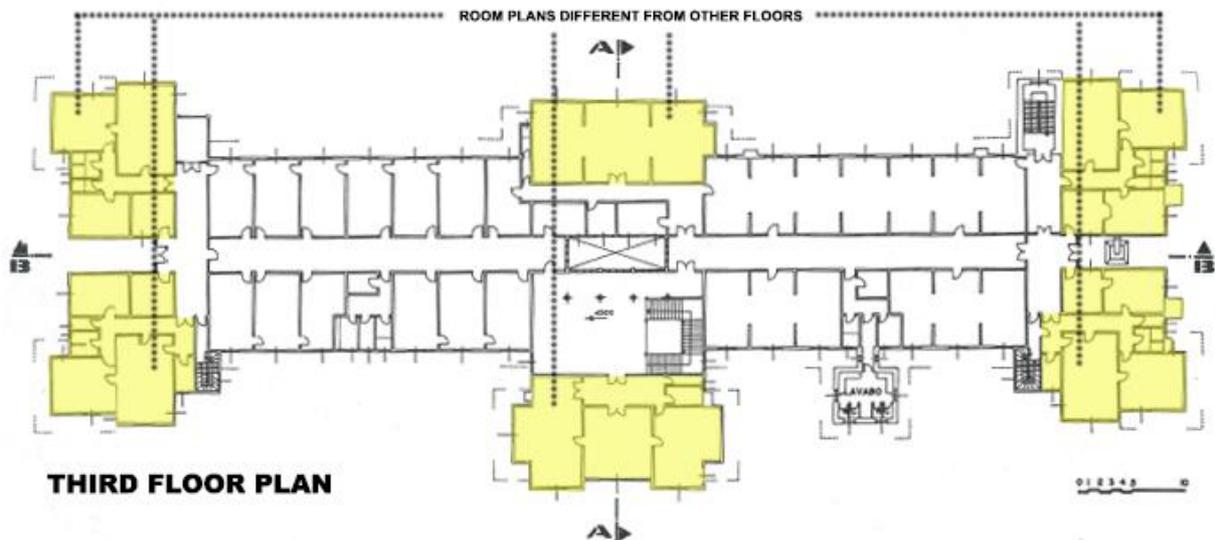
Büyükada Greek Orphanage 3rd Floor Plan (Arkitekt, 1994)
